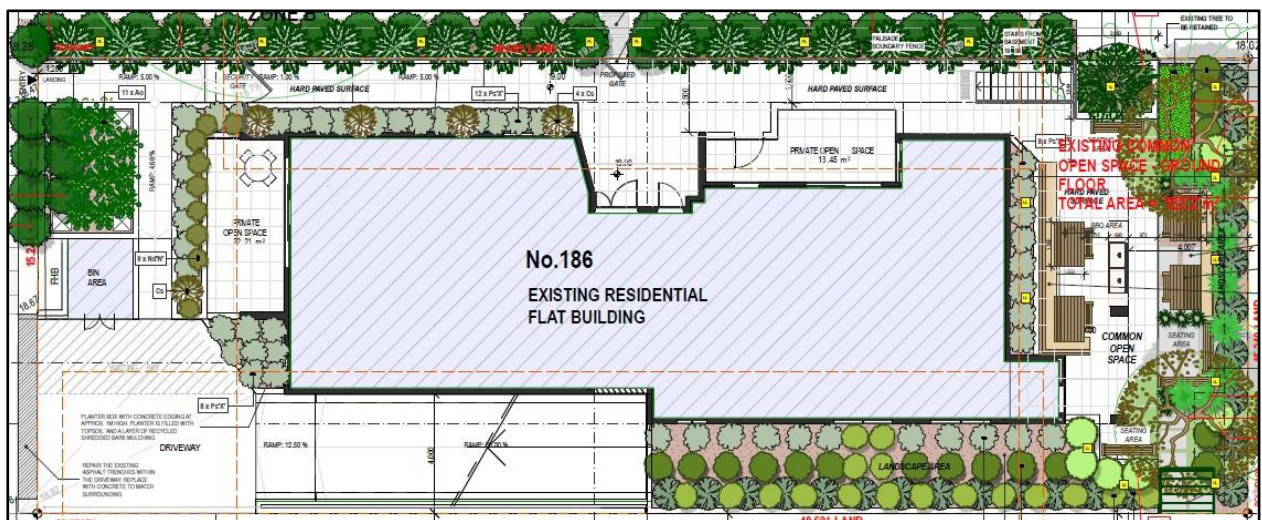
Proposed Ground Floor Plan under DA-166/2026 (Landscape Set).
